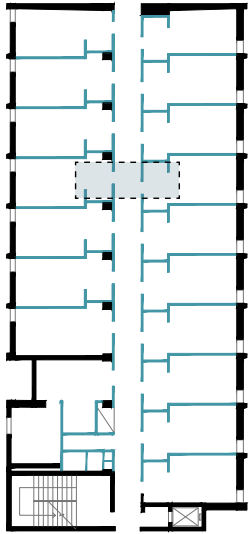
Typical Interior Corridor Section of Convitto\_1.20 Detail
